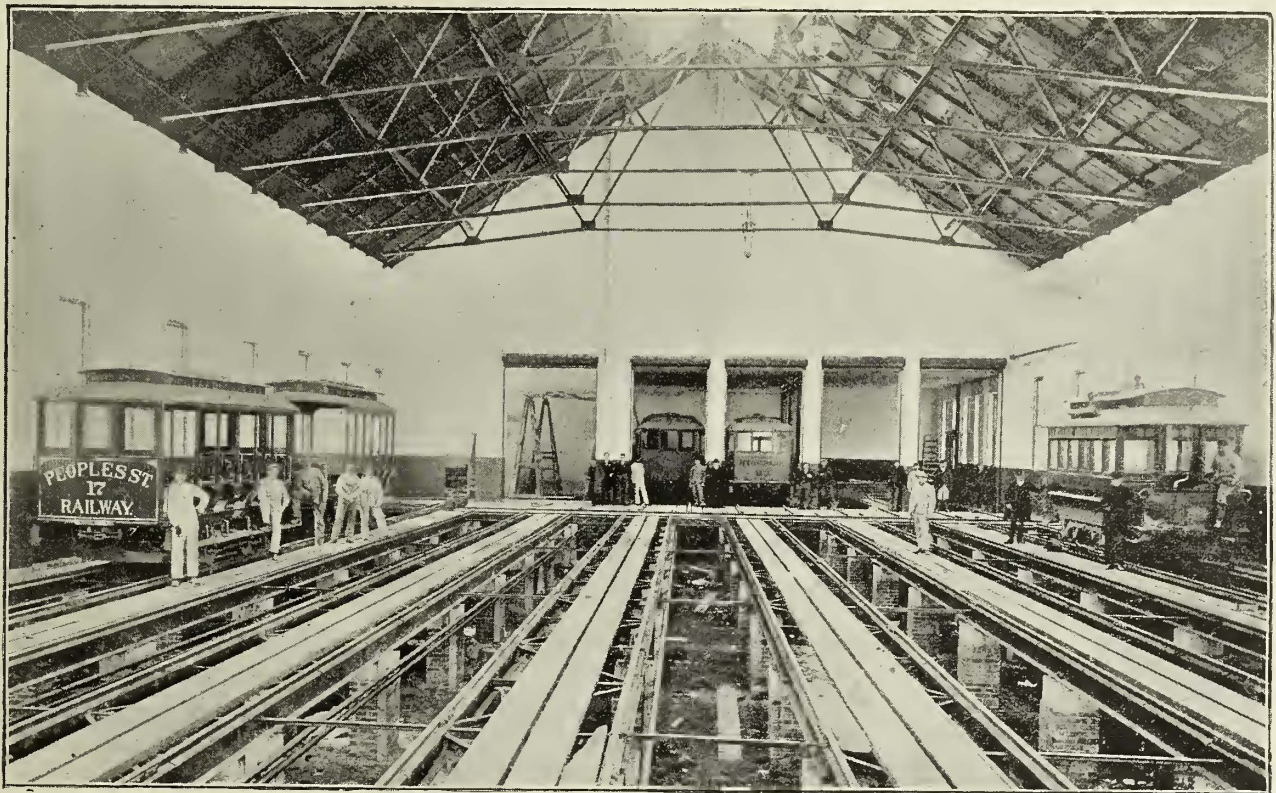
INTERIOR OF NEW CAR HOUSE—PEOPLE'S STREET RAILWAY, SCRANTON, PA.
